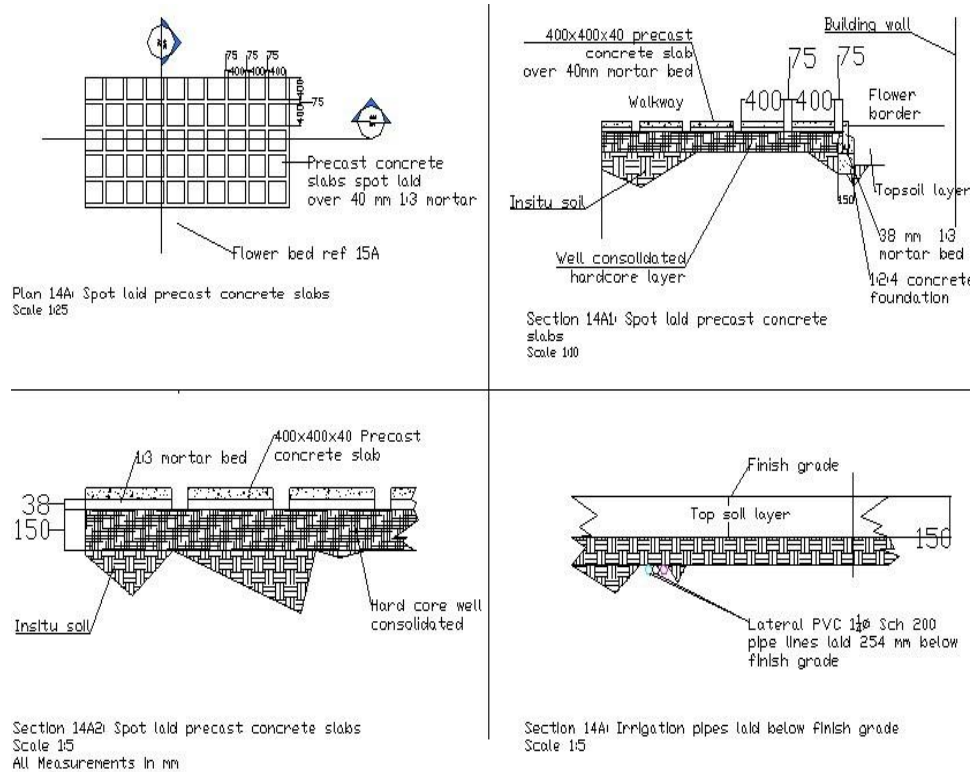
7: Detailing LLSite1 14A - Spot paving
